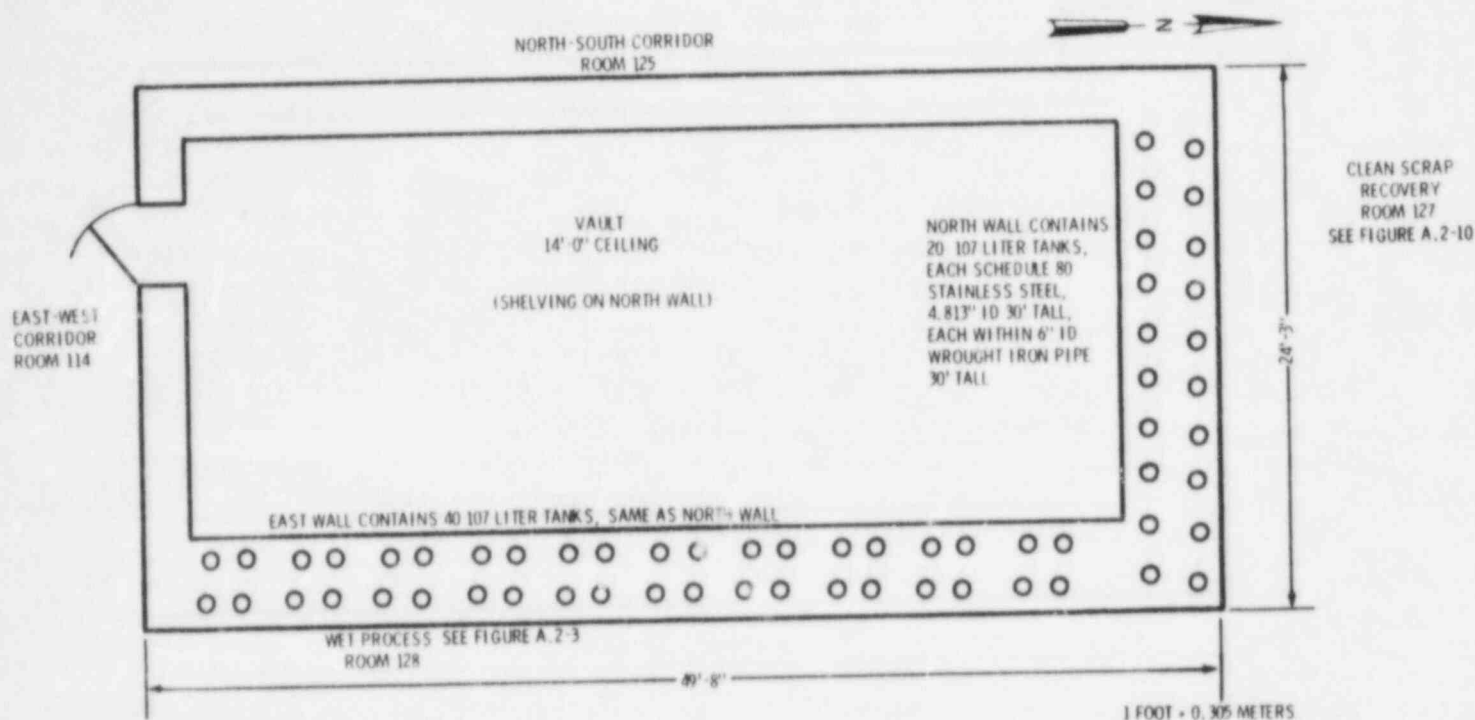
Plan View of Storage Vault and Wall Tanks (Room 126)
